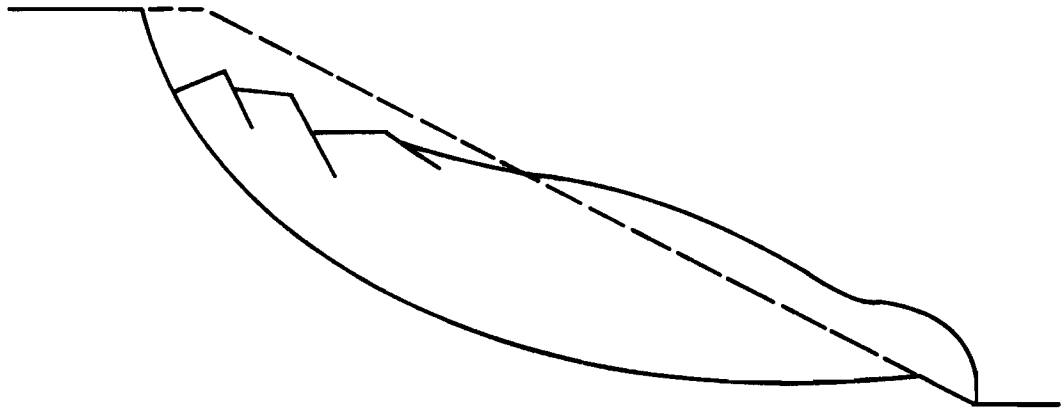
Typical failure which occurs in Texas highway cut and embankment slopes.
